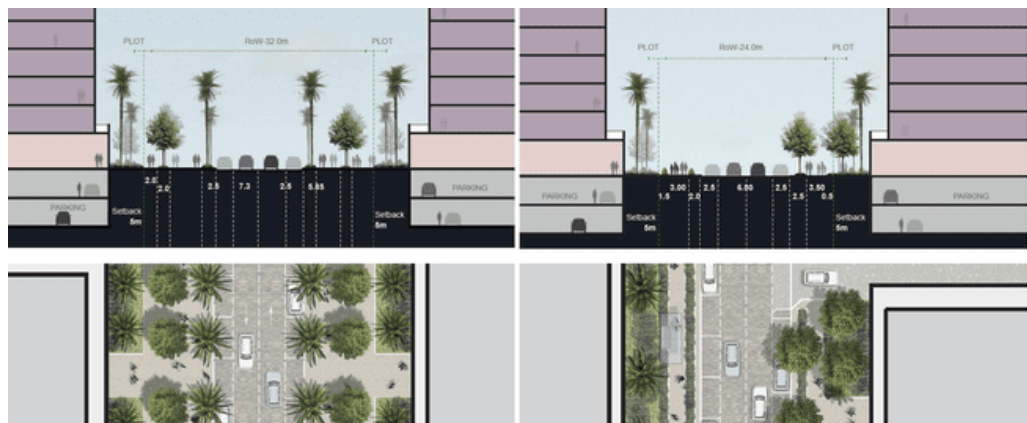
Secondary road cross-section (32m and 28m) (Source: LREDC 2016)
